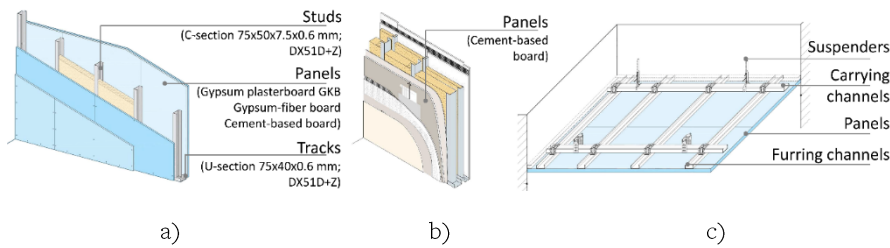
Non-structural lightweight steel drywall building components under investigation: a) lightweight steel gypsum board partition walls; b) exterior walls; c) suspended continuous plasterboard ceilings
